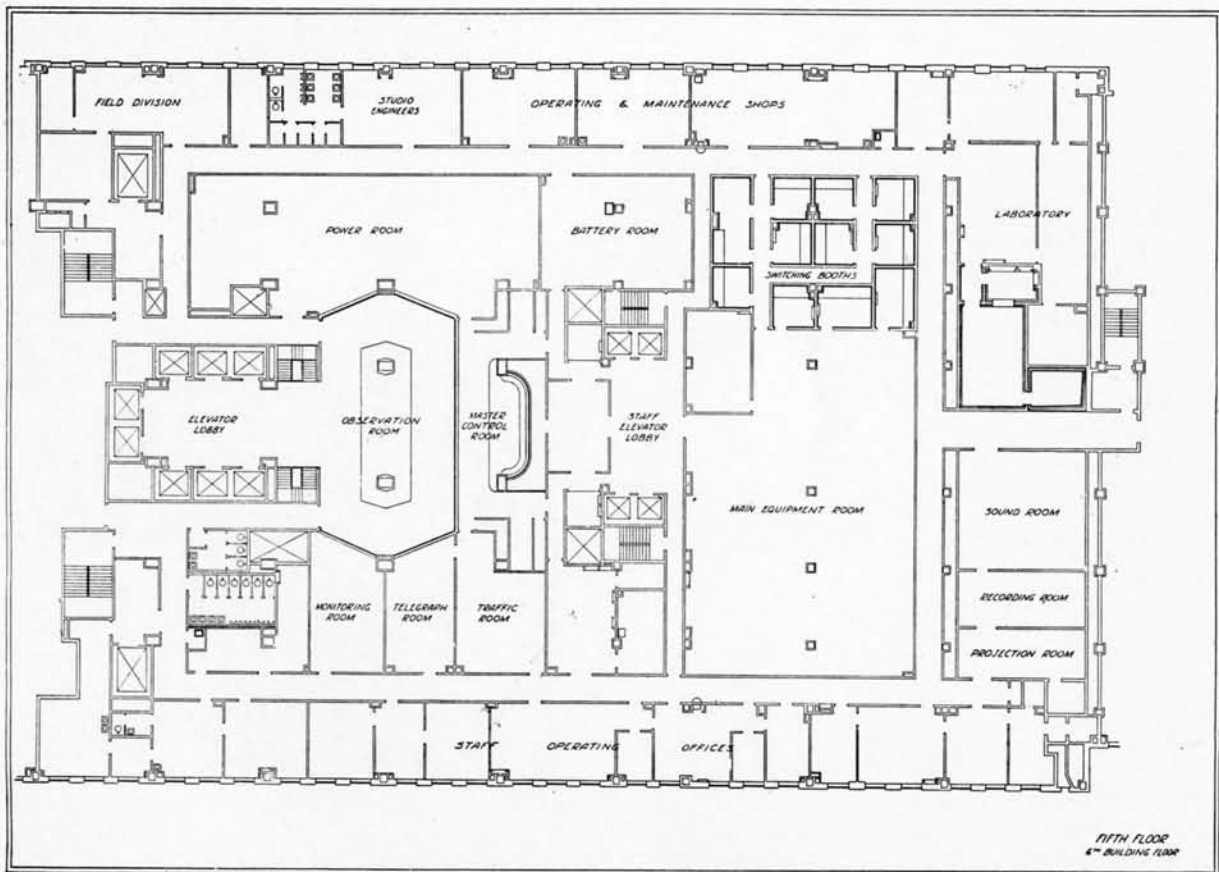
The plan of the fifth floor where the centralized technical equipment is situated. Operating offices and shops are located along the outside walls.
